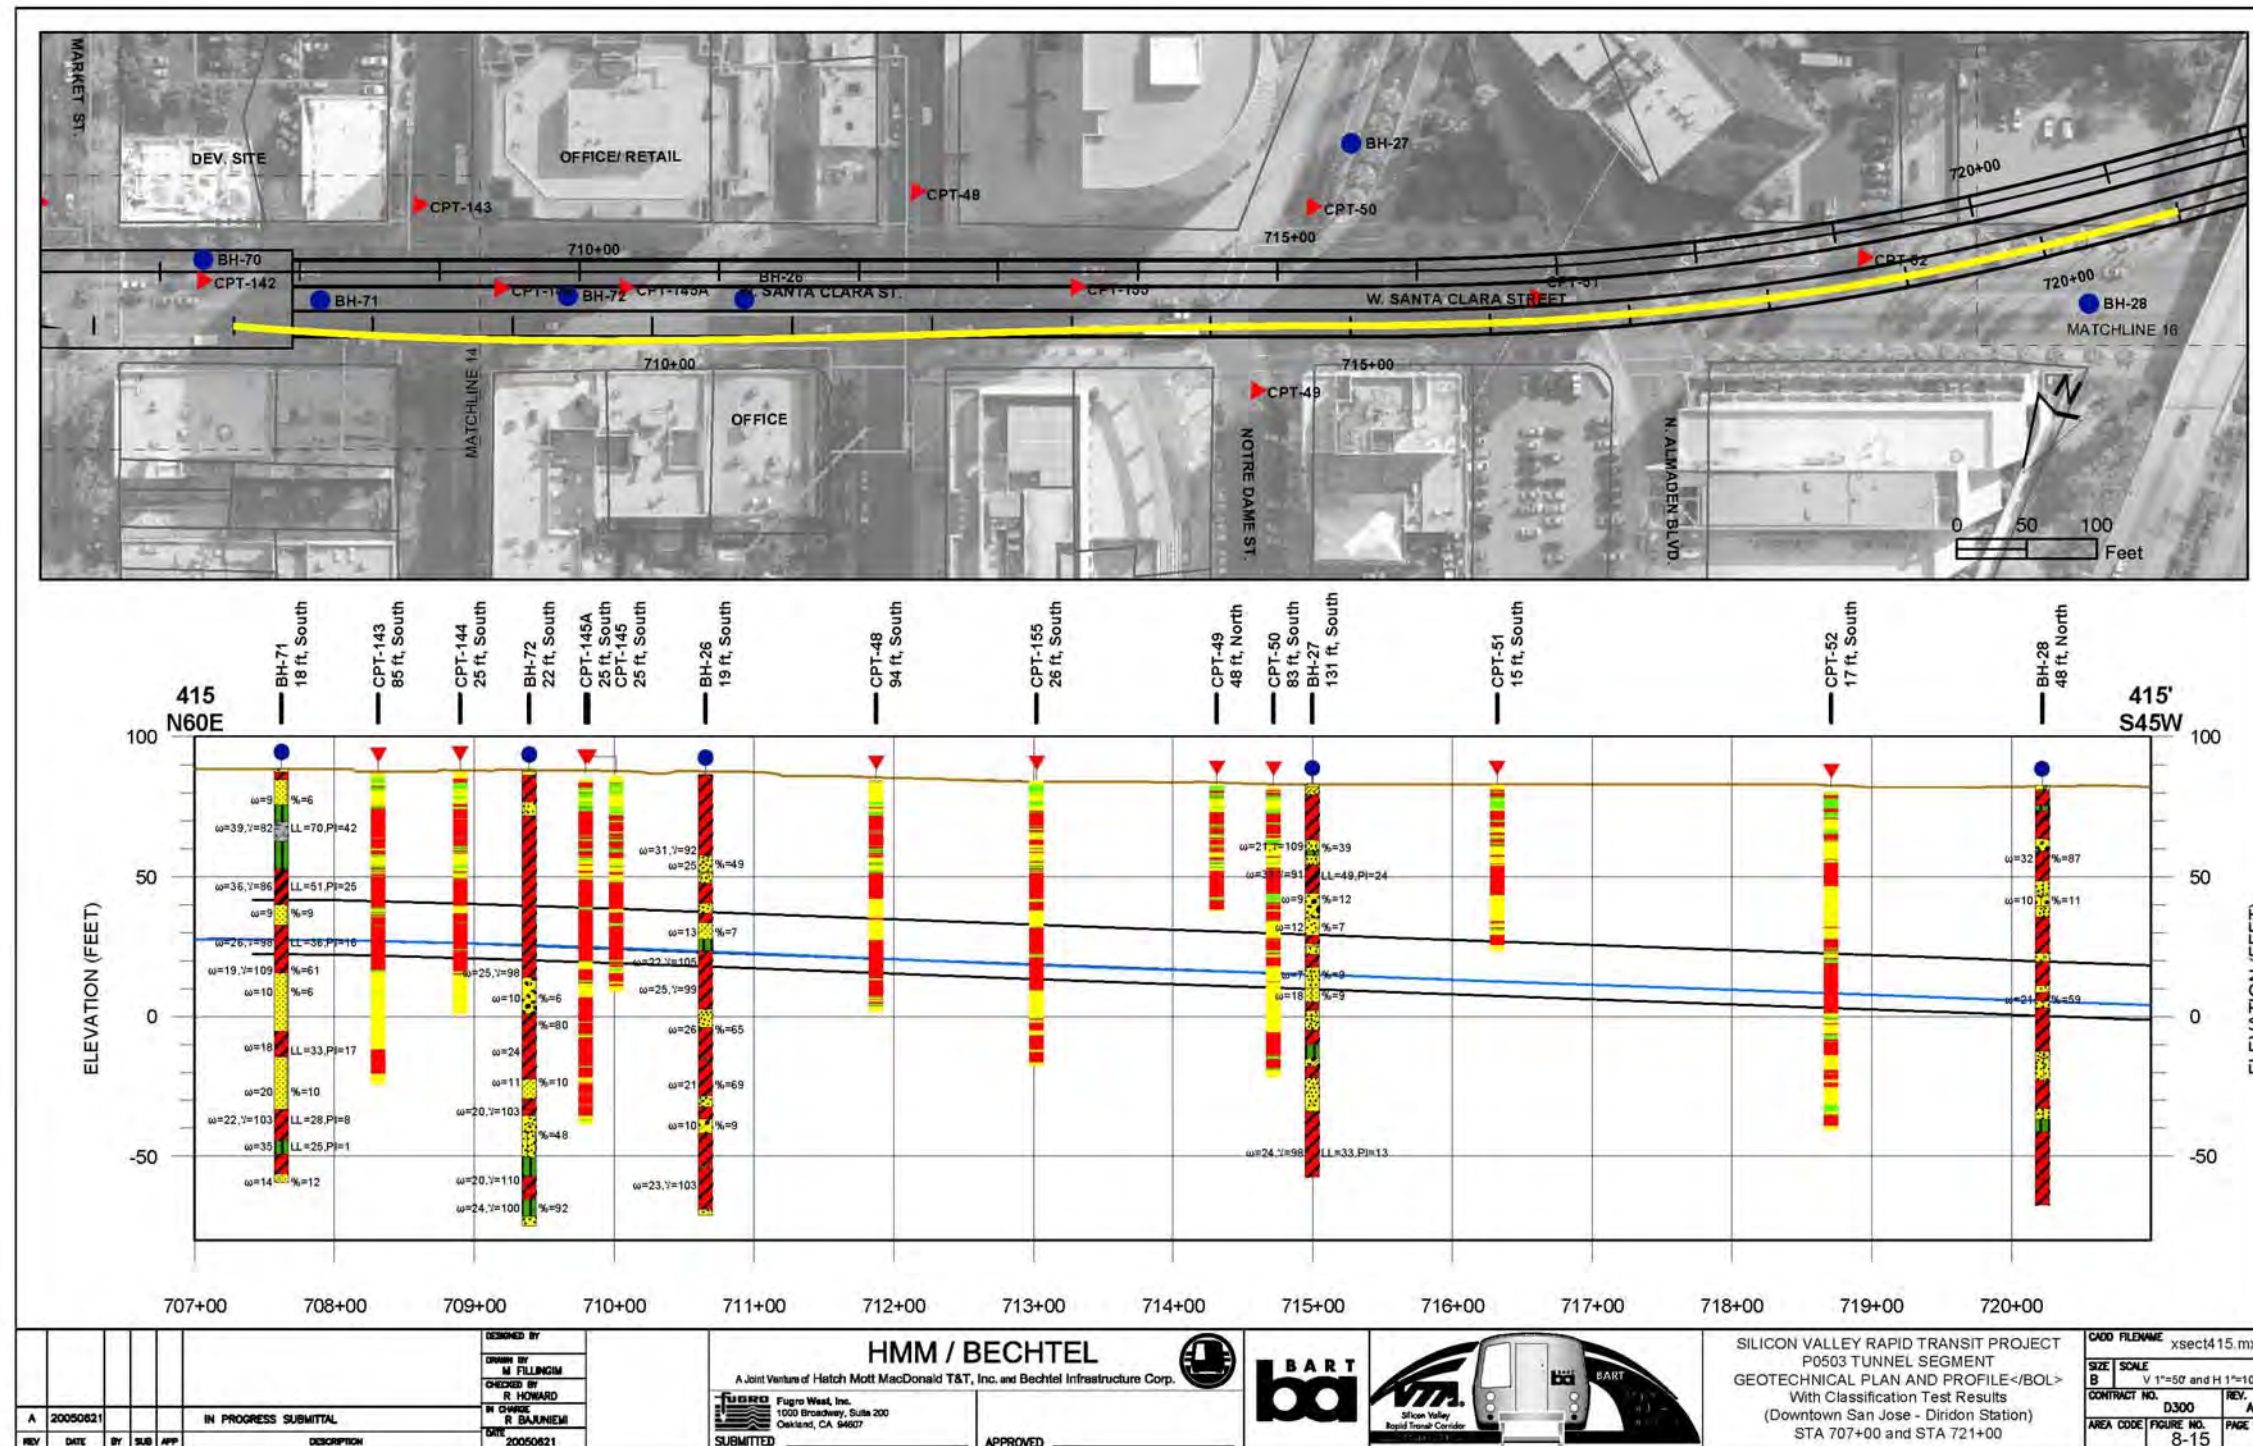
Geotechnical Plan and Profile with Classification Test Results: Station 707+00 to 721+00.
